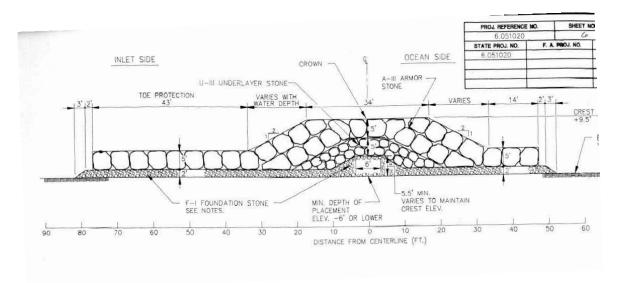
Oregon Inlet Terminal Groin Typical Cross-Section
